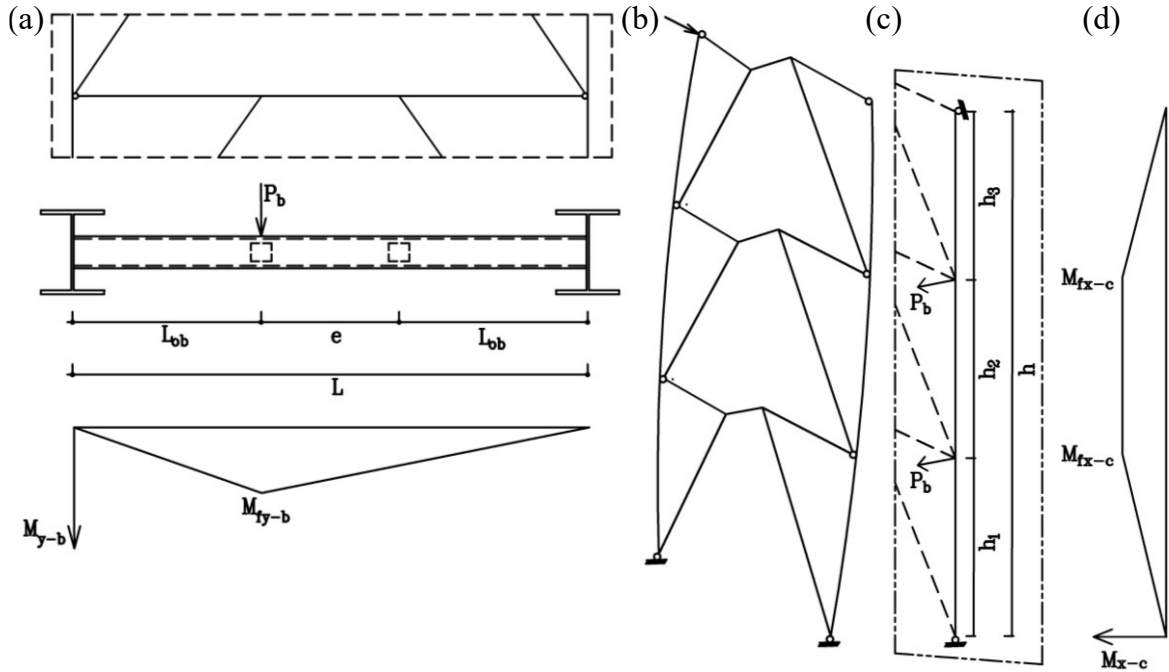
(a) Bracing force and out-of-plane bending moment of intermediate beams; (b) Frame deformed shape under lateral load with exaggerated out-of-plane deformation; (c) Bracing forces acting on the column out-of-plane; (d) Column out-of-plane bending moment.
